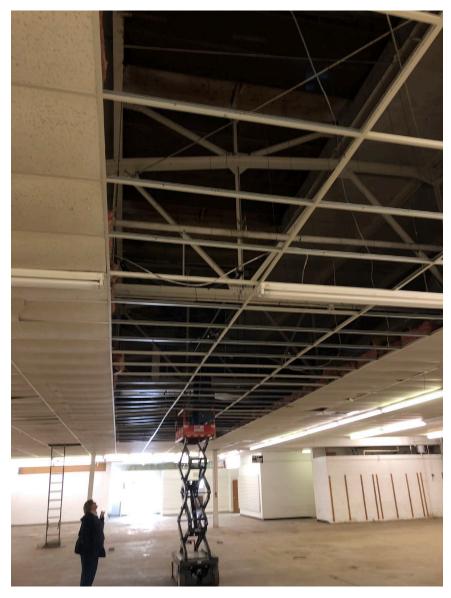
Roof trusses exposed looking N, shot 01-08-19.
